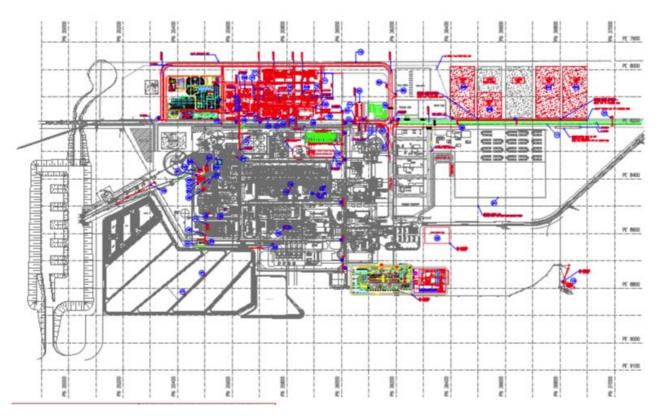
LAYOUT OF THE NEW PLANT SET UP AREA, PROPOSED MODIFICATION ARE INDICATED IN RED (REFER TO APPENDIX D FOR THE DETAILED LAYOUT)
